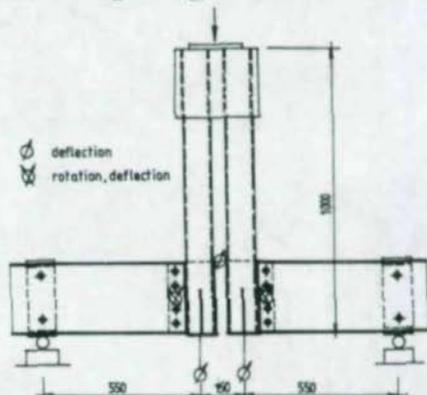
A Cruciform Test Setup for an External Beam-to-Column Joints
